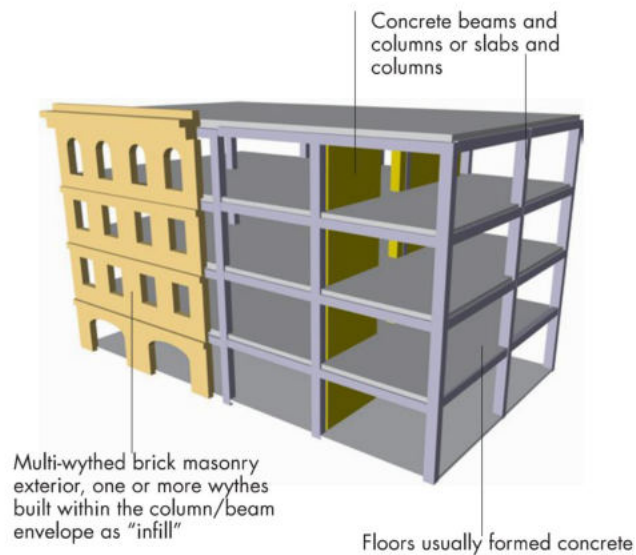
FEMA building type C3, concrete frames with infill masonry (adopted from [15])
